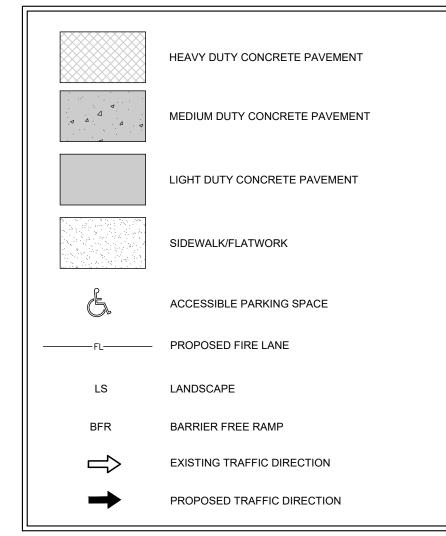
OF 2) DEVELOPMENT PLAN DEBBIE LANE BUSINESS PARK
